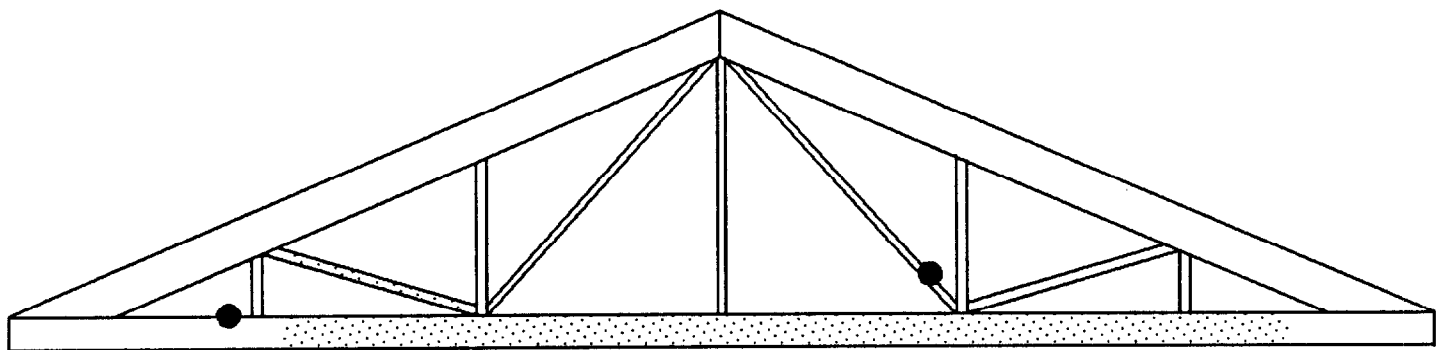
Building 17, Lab 10 Walls and Ceiling Support – Remediated Areas and Measurement Locations
